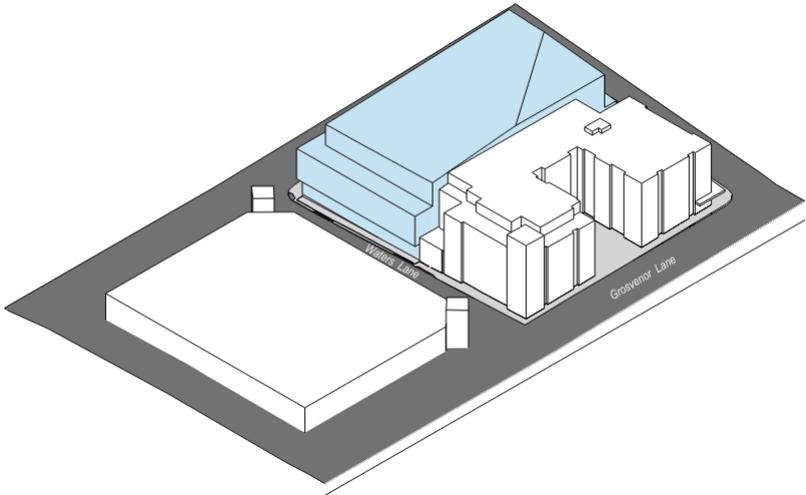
Permitted Building Envelope looking north-east (source: SJB Architects)
